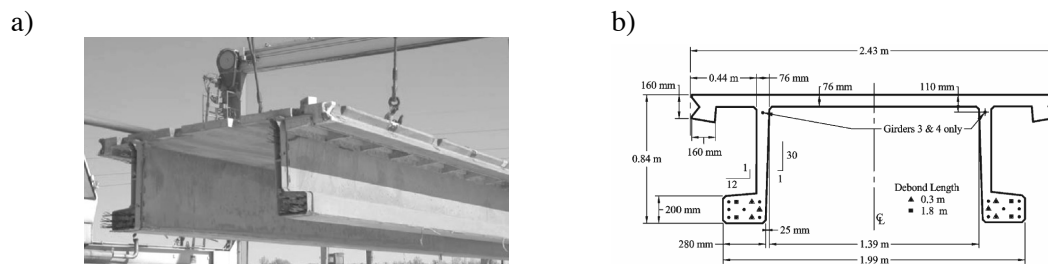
Road bridge in Virginia: a) placement of one of the two girders (π -shaped beam) b) details of main girder cross section [Graybeal, Hartmann 2005]
